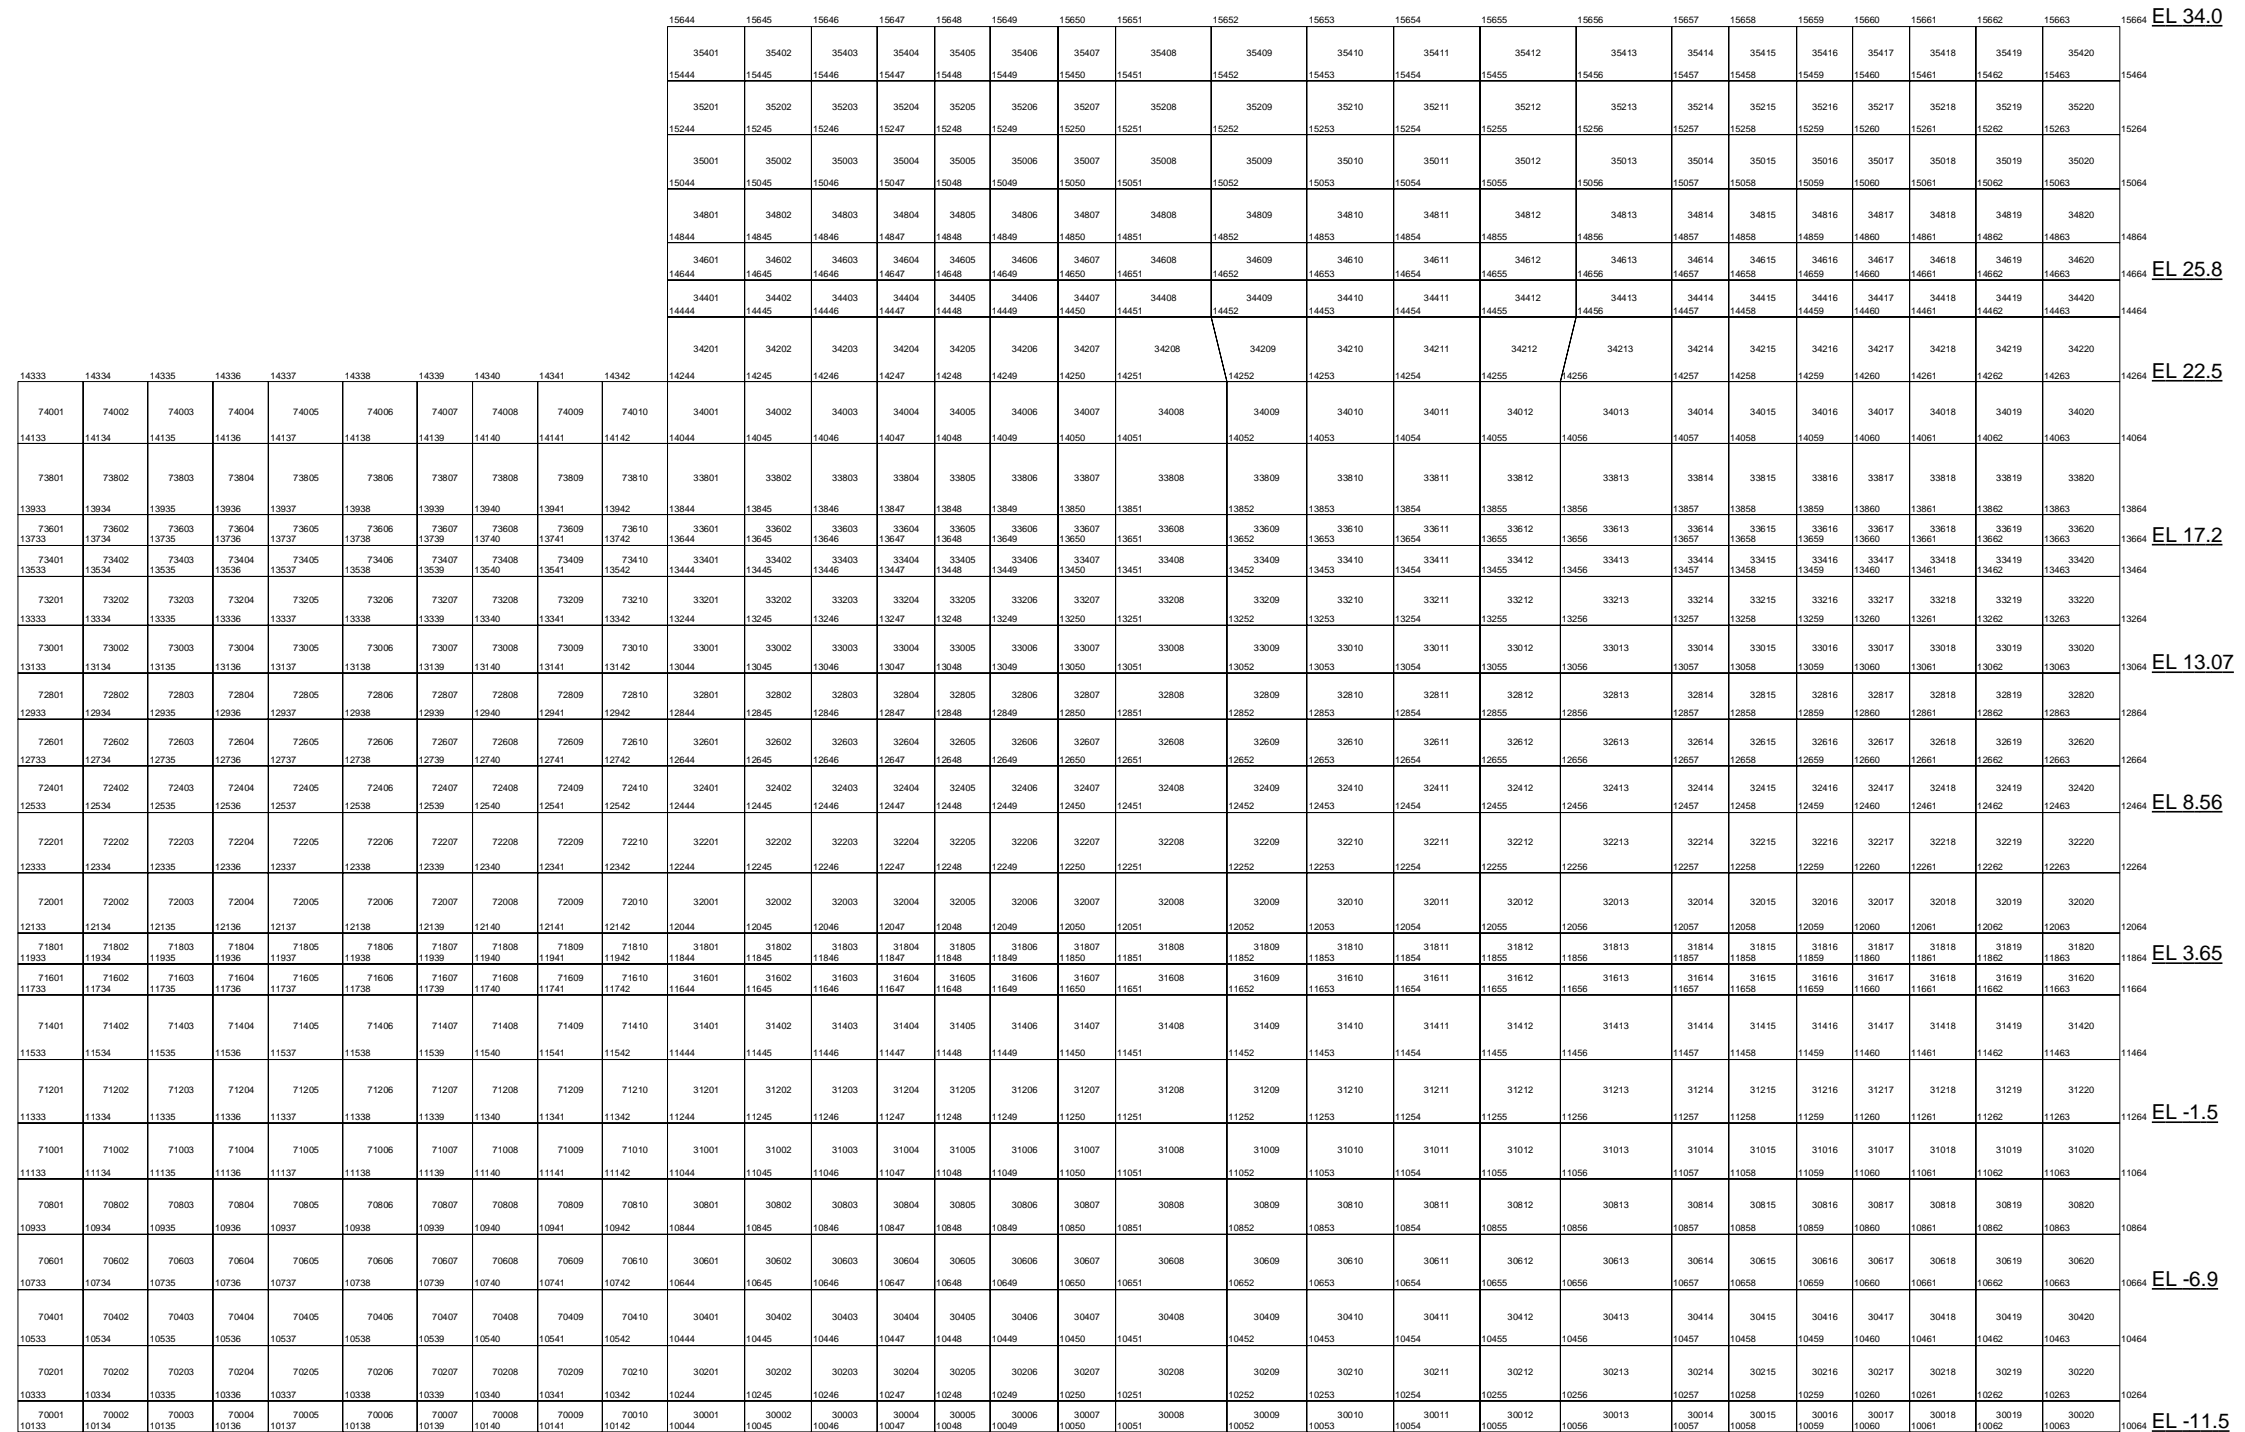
G.1-15. FE Model of RB/FB (External Wall: East Side)
